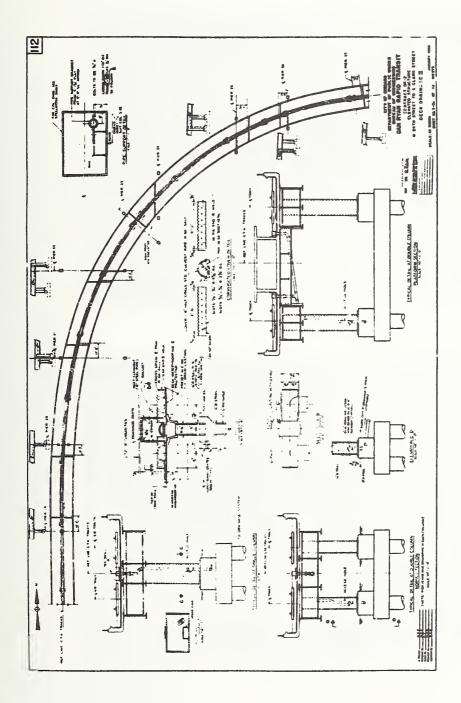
TYPICAL SECTION OF CTA ELEVATED STRUCTURE ON THE ON THE LAKE ST. SERVICE
